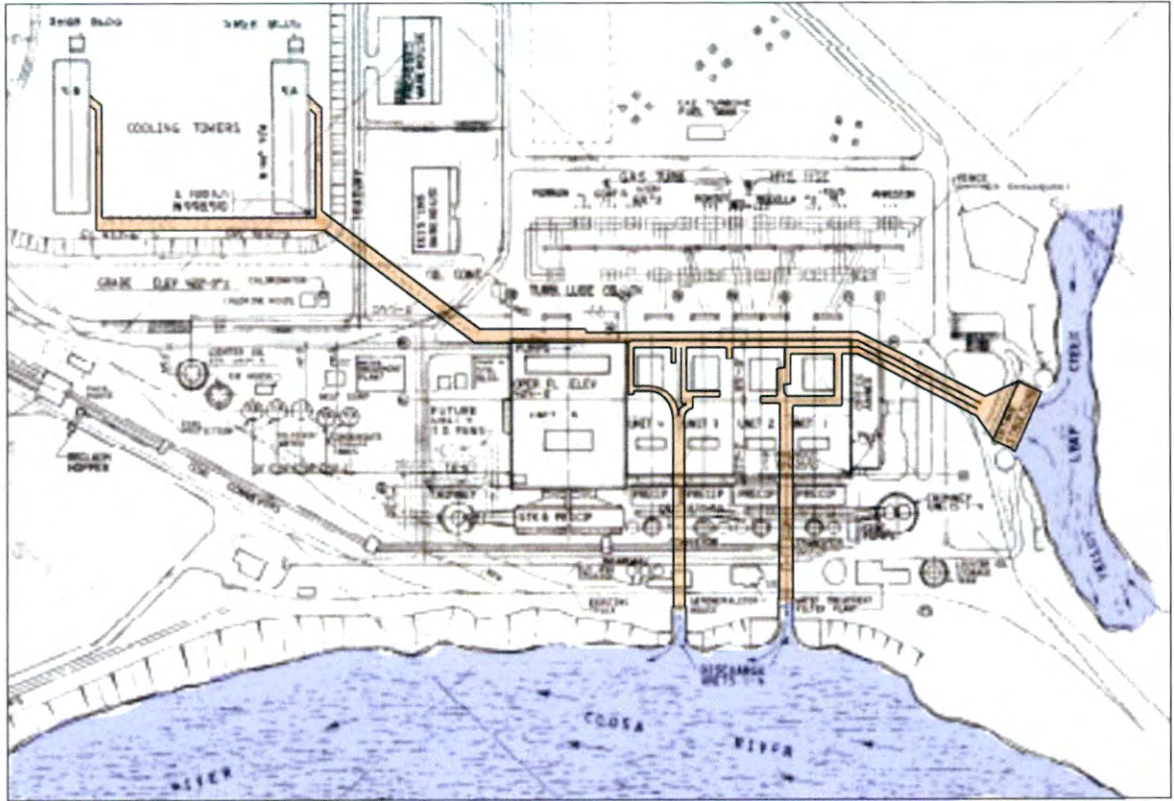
Site Layout of E.C. Gaston Steam Plant with Intake, Discharge and Circulating Water Passages Highlighted
